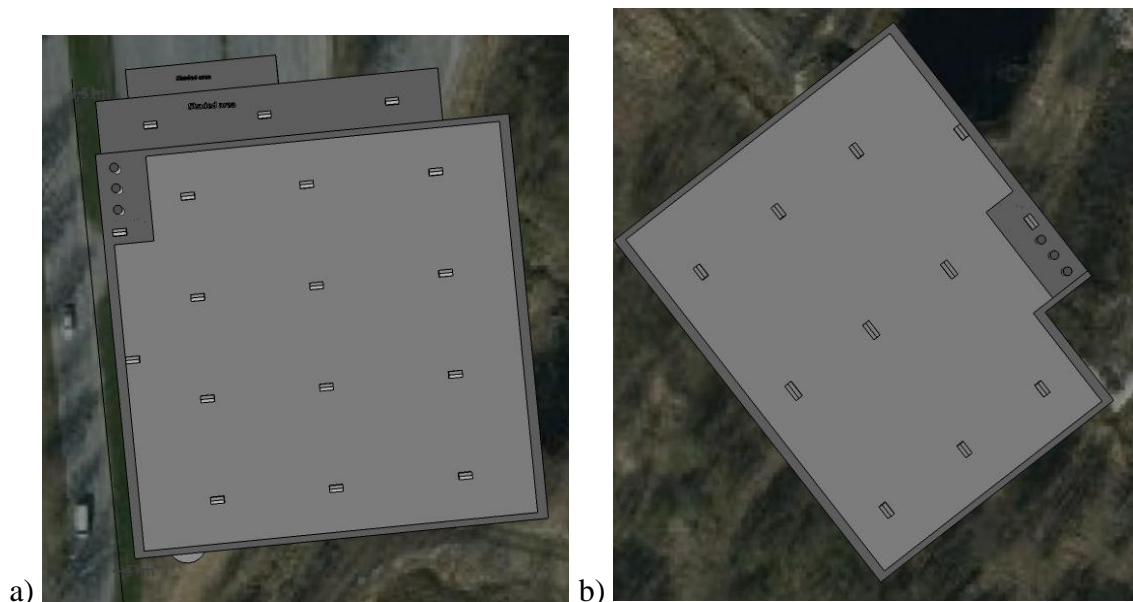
Used roof layouts of a) buildings 1 and b) building 2
